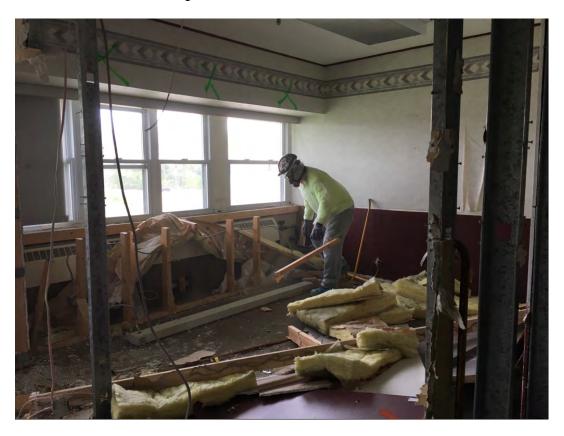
Administration Building, First Floor Office Area, Selective Demolition
